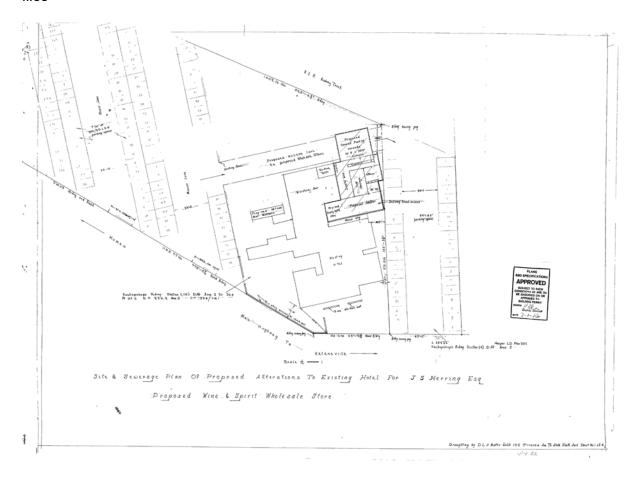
Proposed addition of Wholesale Store (1974). Building permit application, BPA 27735. Accessed via Auckland Council files.
